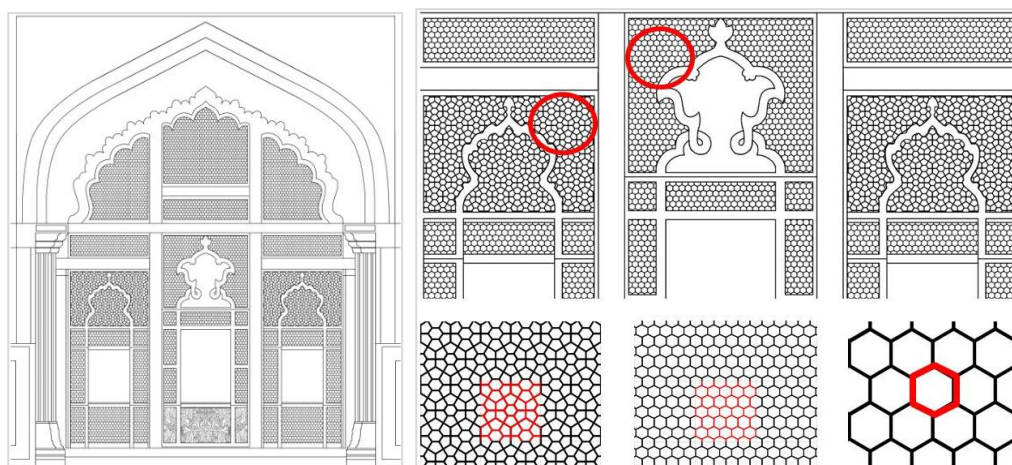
Drawings of the pavilion and the central arch of Naulakha Pavilion, with intricate patterns carved out from marble. The pattern tessellation drawn by author
